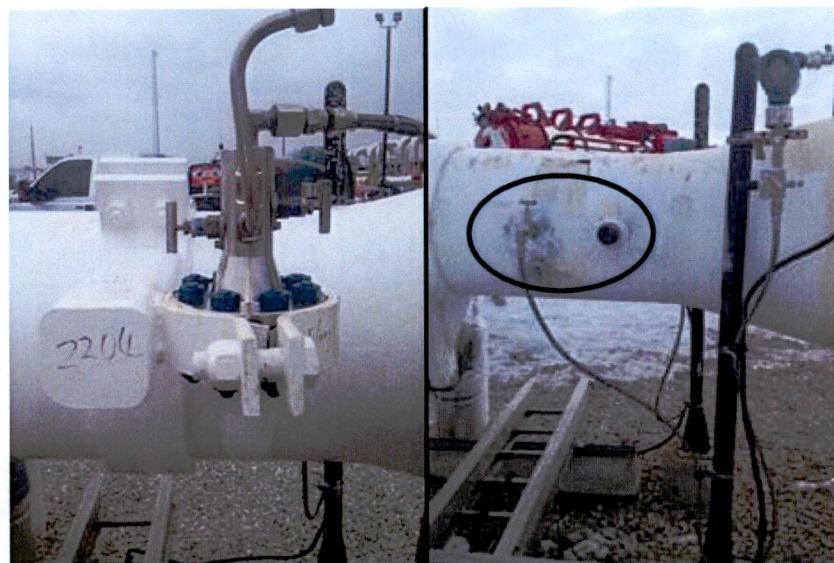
PT-2204 branch connection: original configuration (left) and new root valve (right).
